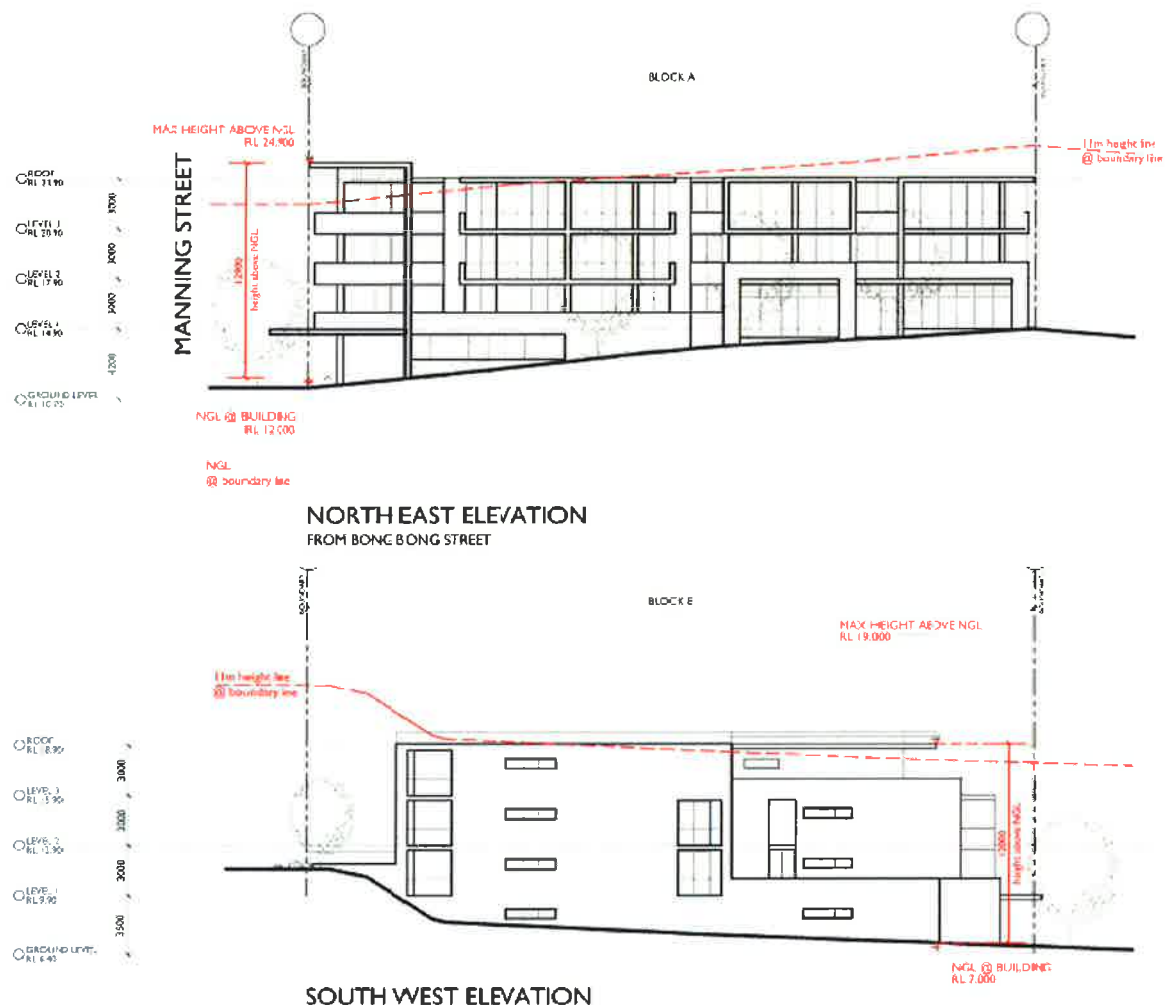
Excerpt from ADM Architects Dwg A10 Rev B (Elevations) indicating portion of building exceeding 11m building height
